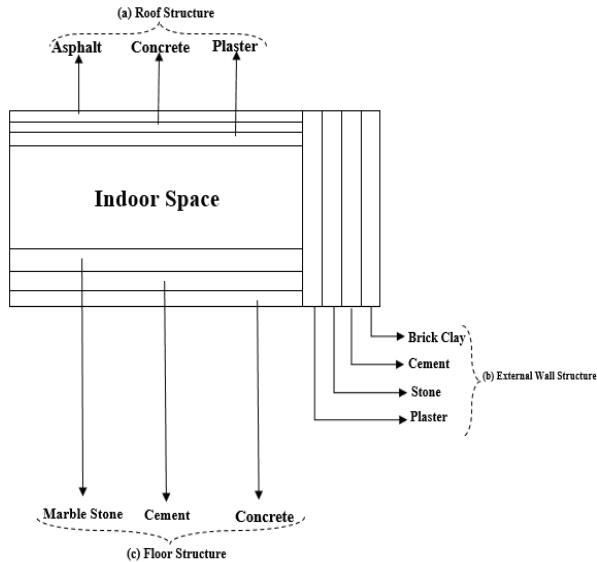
CMUAB roof, external walls, and floor structures layout: (a) Roof structure, (b) External wall structure, (c) Floor structure
